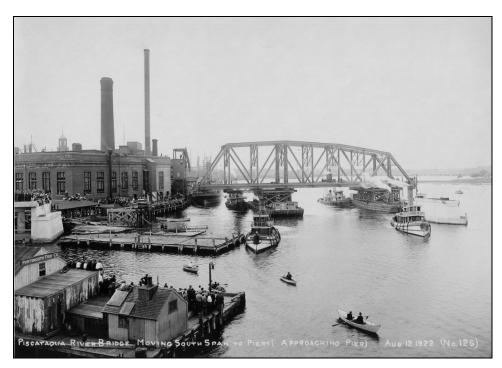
Moving South Span to Piers, August 12, 1922 (Portsmouth Athenaeum)
